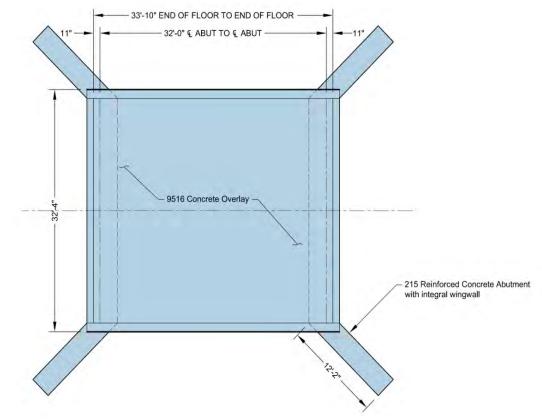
EI.24.6- 2: Plan view of prestressed concrete double T Beam bridge
